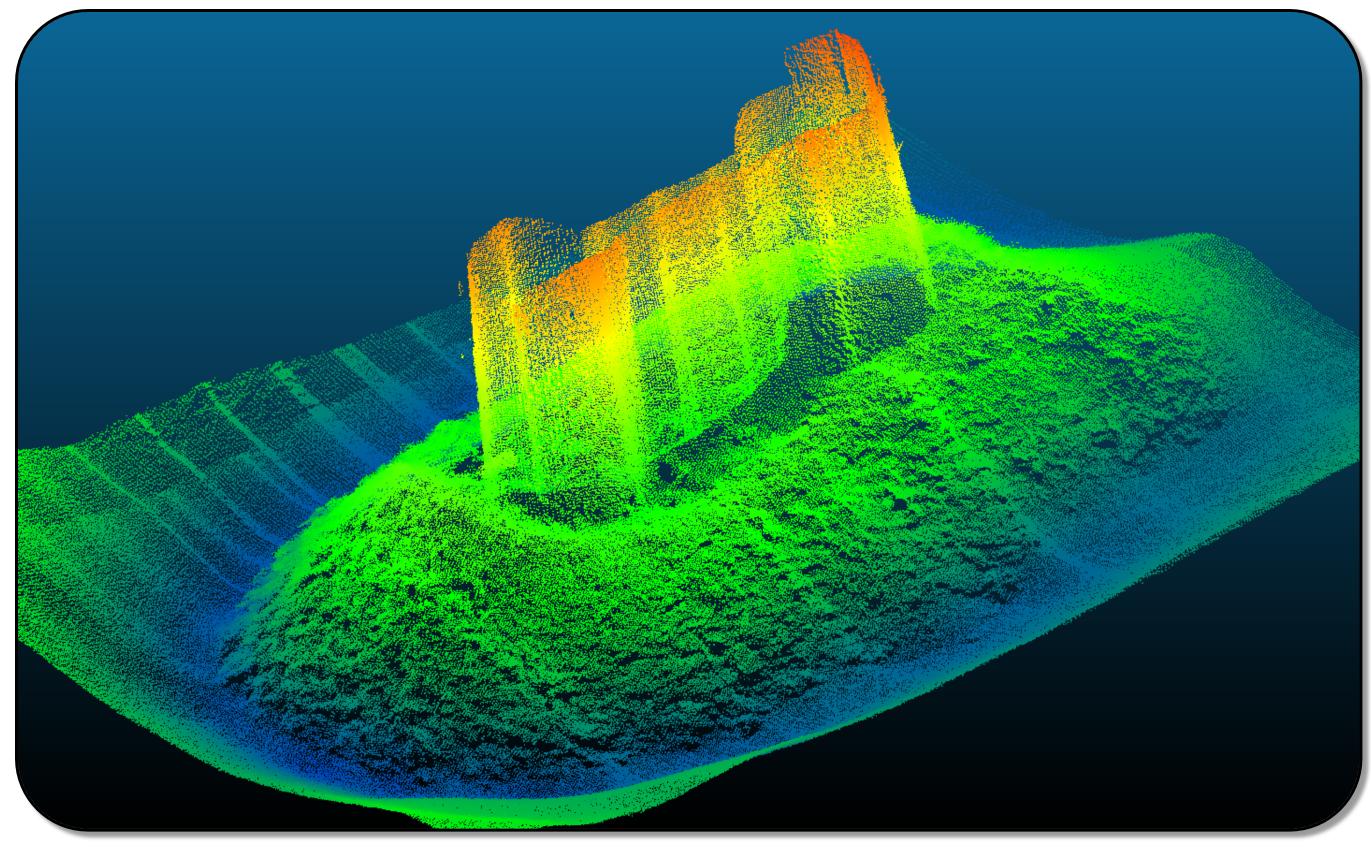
Perspective view of Pier 11 point cloud (looking from the northeast direction).
